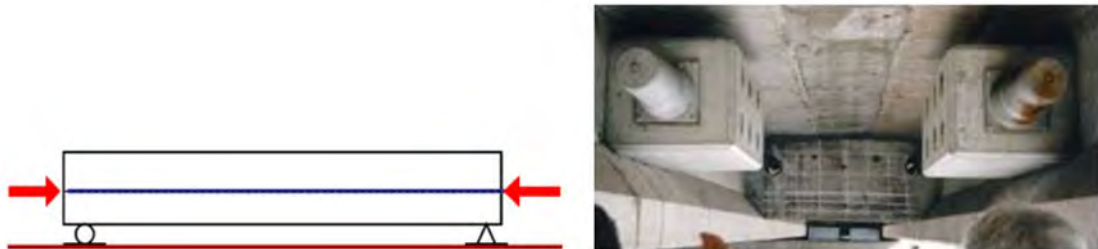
Typical post tensioning using stressbars (Source: FBE)
